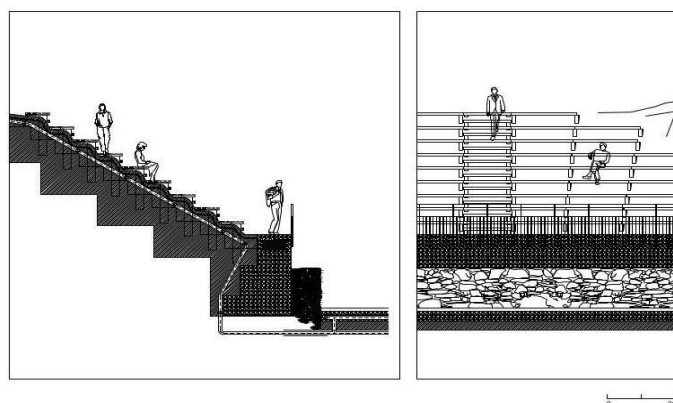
Conservation and Enhancement of the Ammaia Amphitheater. Construction section.
